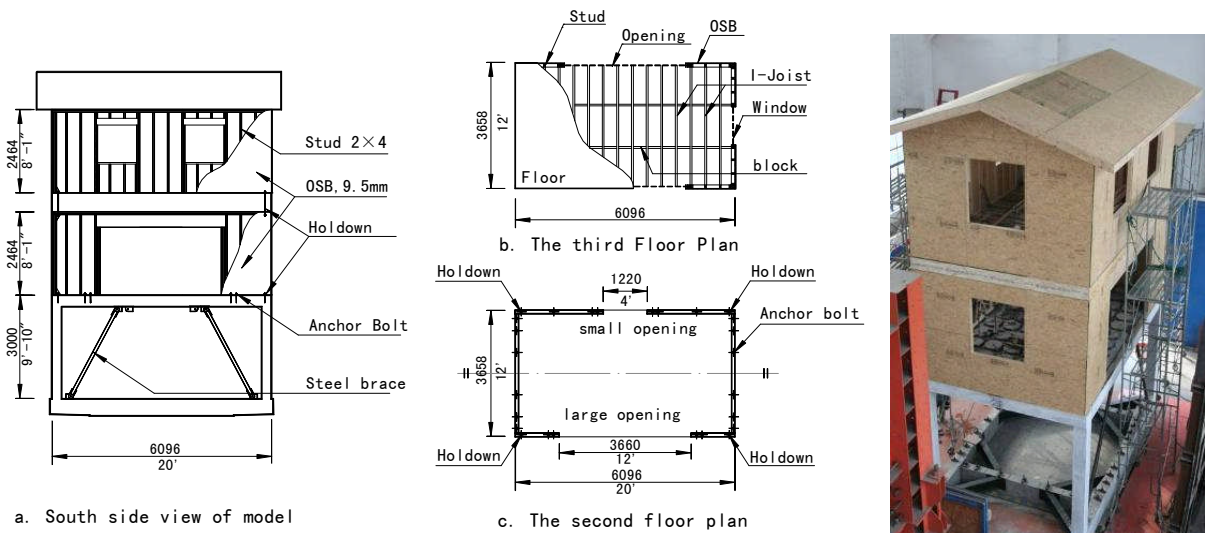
Schematic and photo of the wood-concrete hybrid specimen
